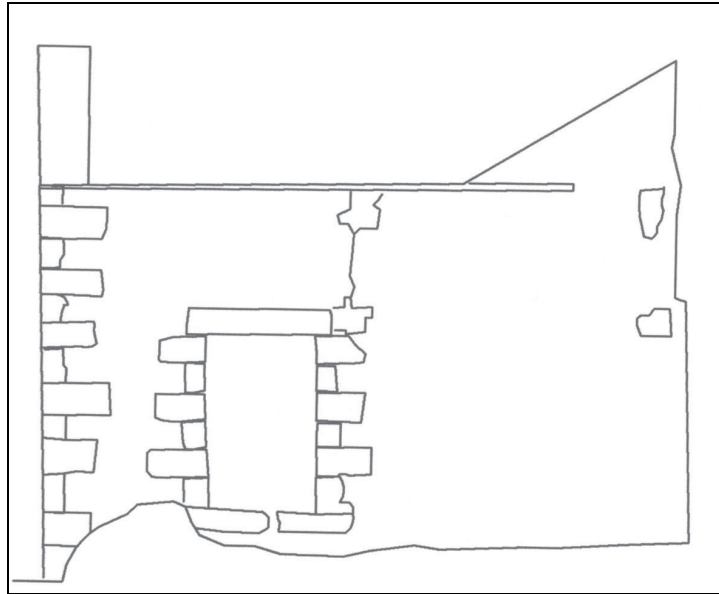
Eastern elevation of main mill building (Scale 1:80)
